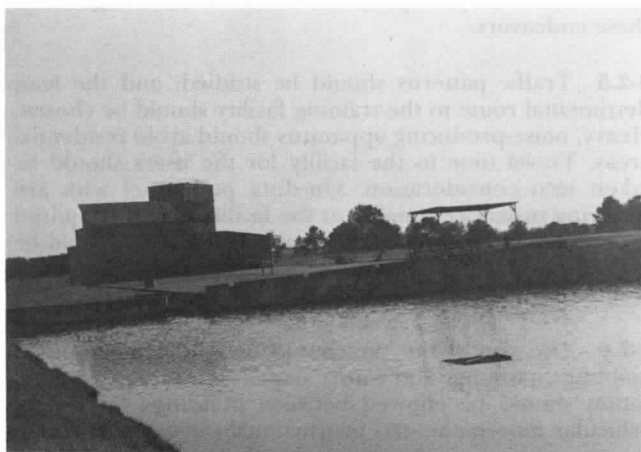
Pump testing area. Pump test can vary drafting height from 3 to 8 ft (10 cm to 240 cm). Note splash wall, pump test stand and protective cover area for students. Mississippi Fire Academy.
